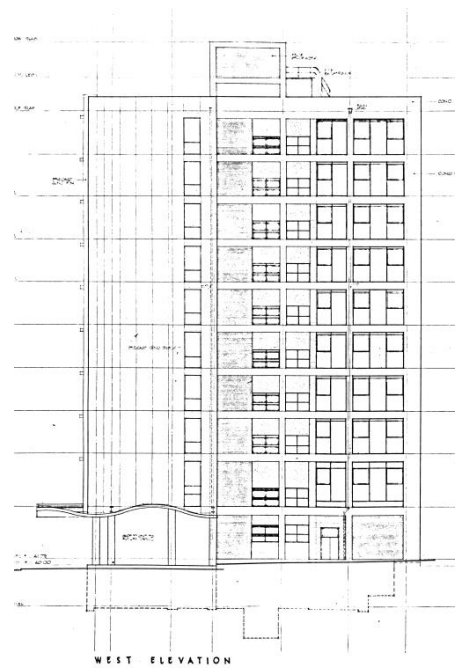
West elevation. Drawing date stamped February 1963 (BAP).
